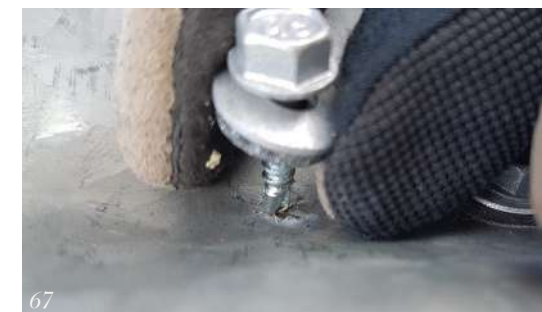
Mounting of metal sheets and closing the holes. April 14
